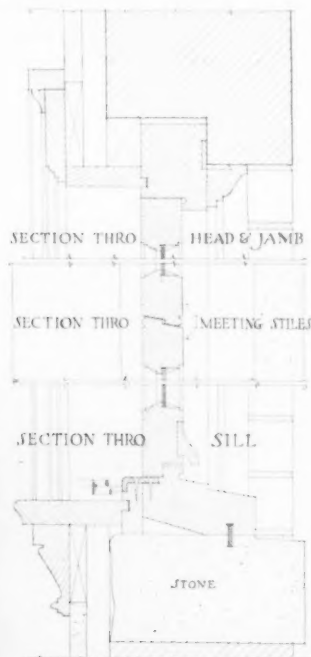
Fig. II. Detail of Wooden Casements Opening In, Set in a Masonry Wall
